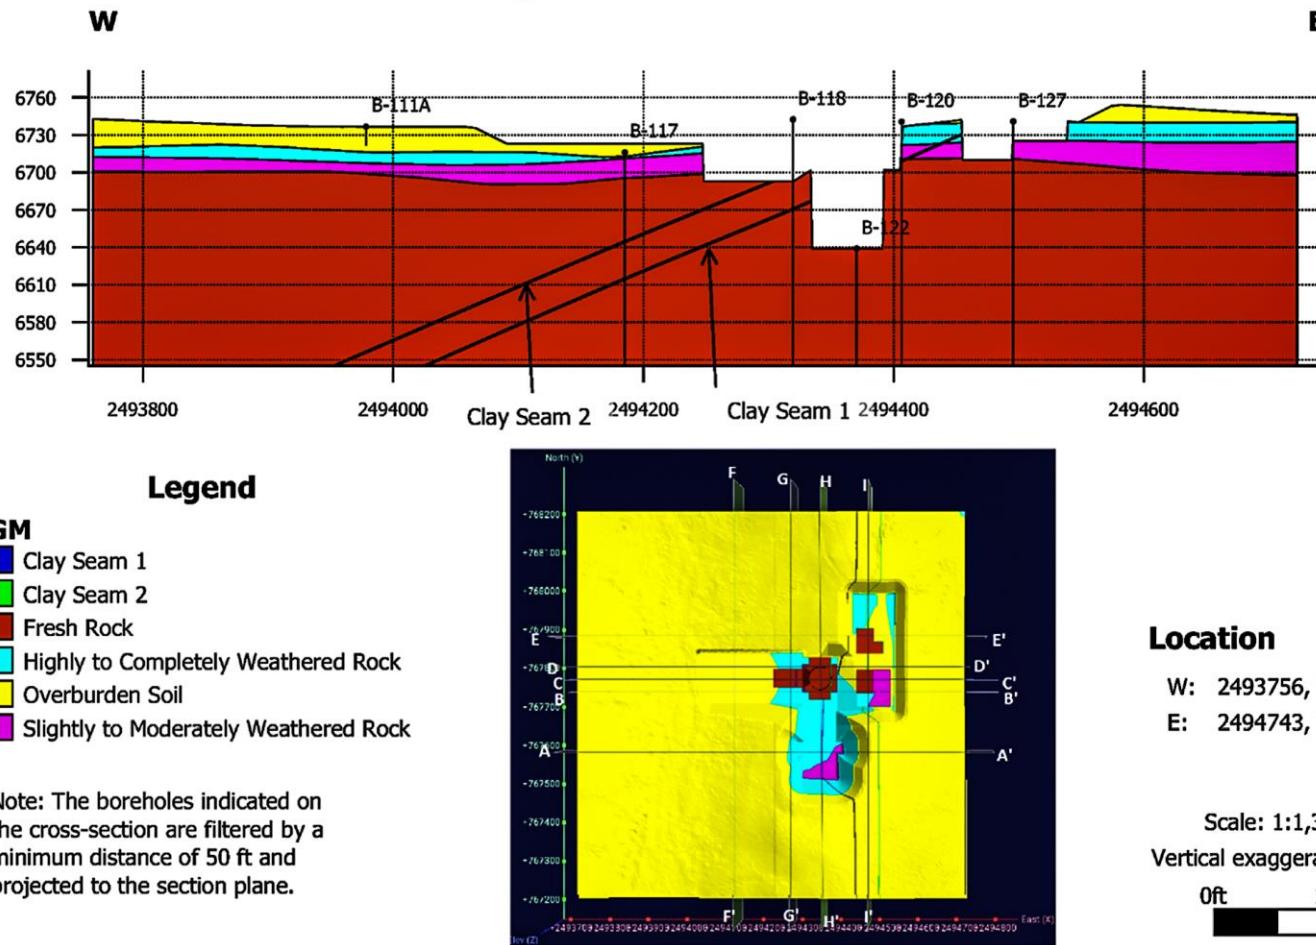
East-West Cross Section (Vertical Axis Shows Elevation, ft NAVD 88) through the Reactor Building Location of Kemmerer Unit 1 Showing the Extent of Proposed Excavations and the Subsurface Materials Encountered in Site Borings. Source: TerraPower 2024-TN10896.
